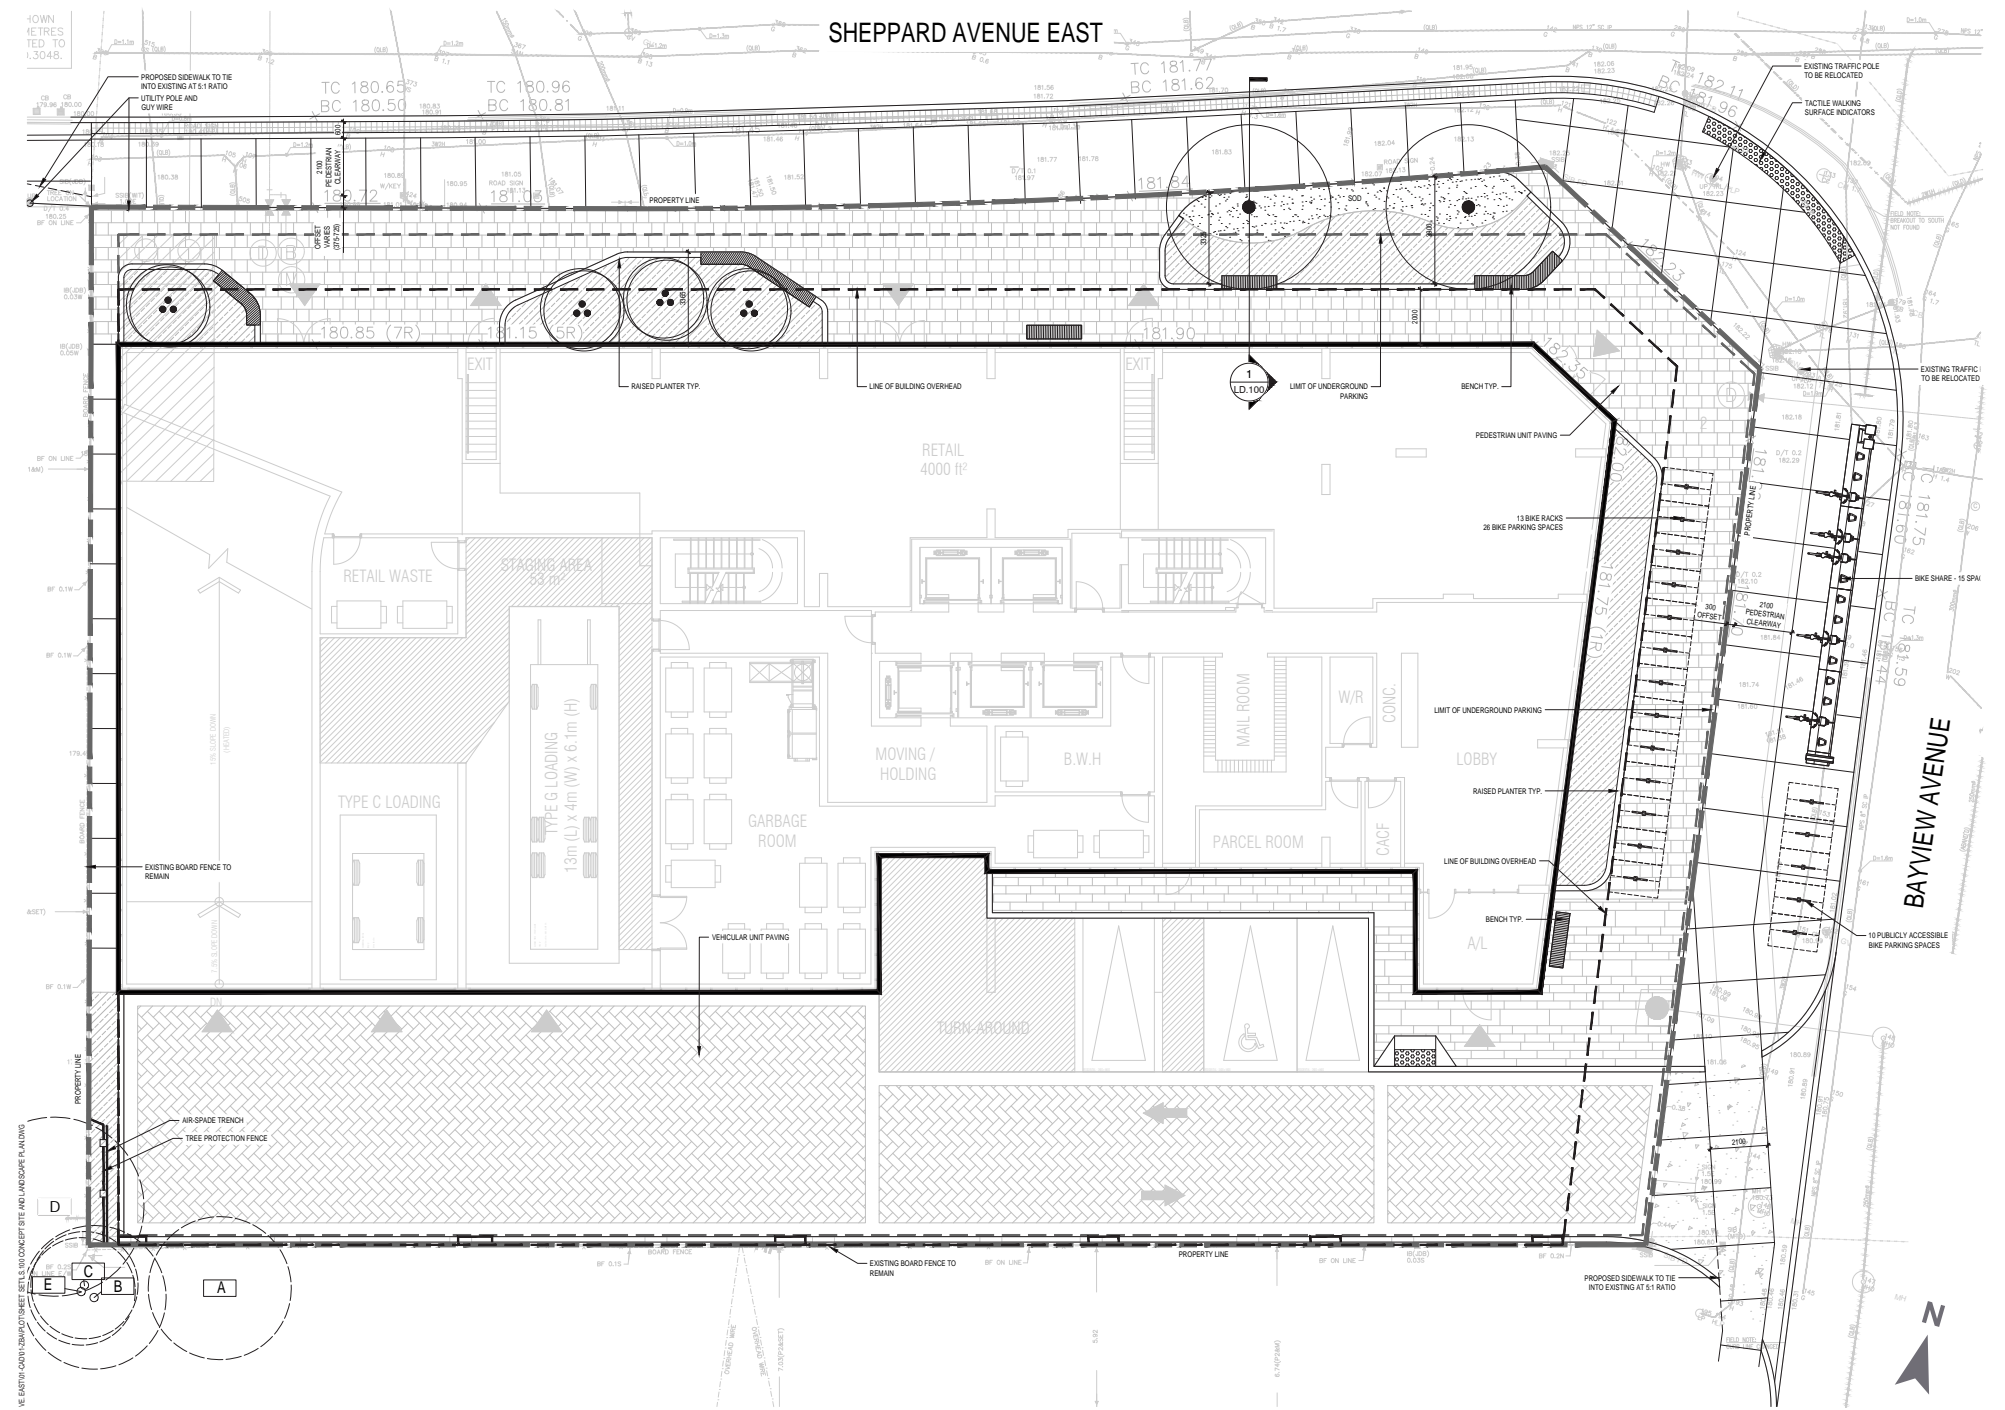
Proposed Landscape Plan Prepared by Studio TLA [Date Prepared: November 16, 2023]
